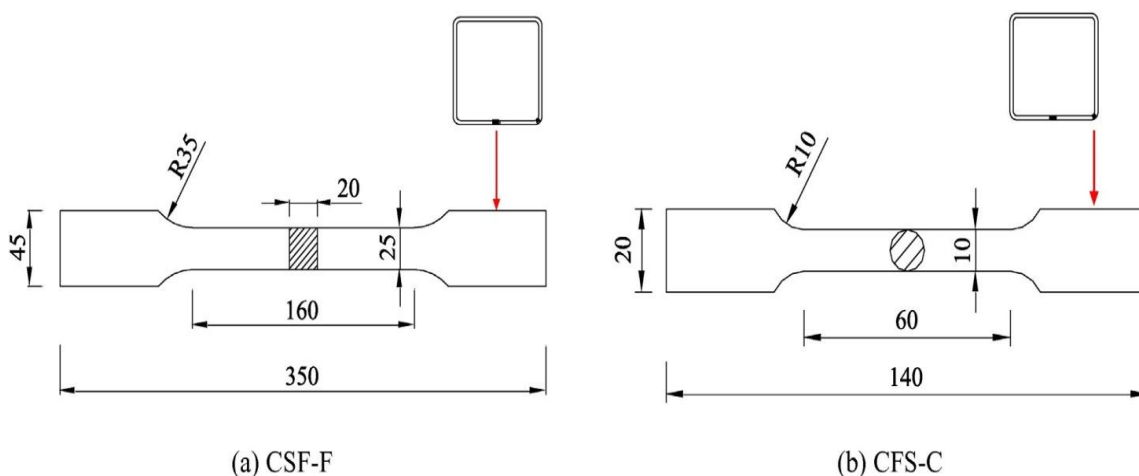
Sampling positions and dimensions of the cold-formed Q235 steel specimens.
